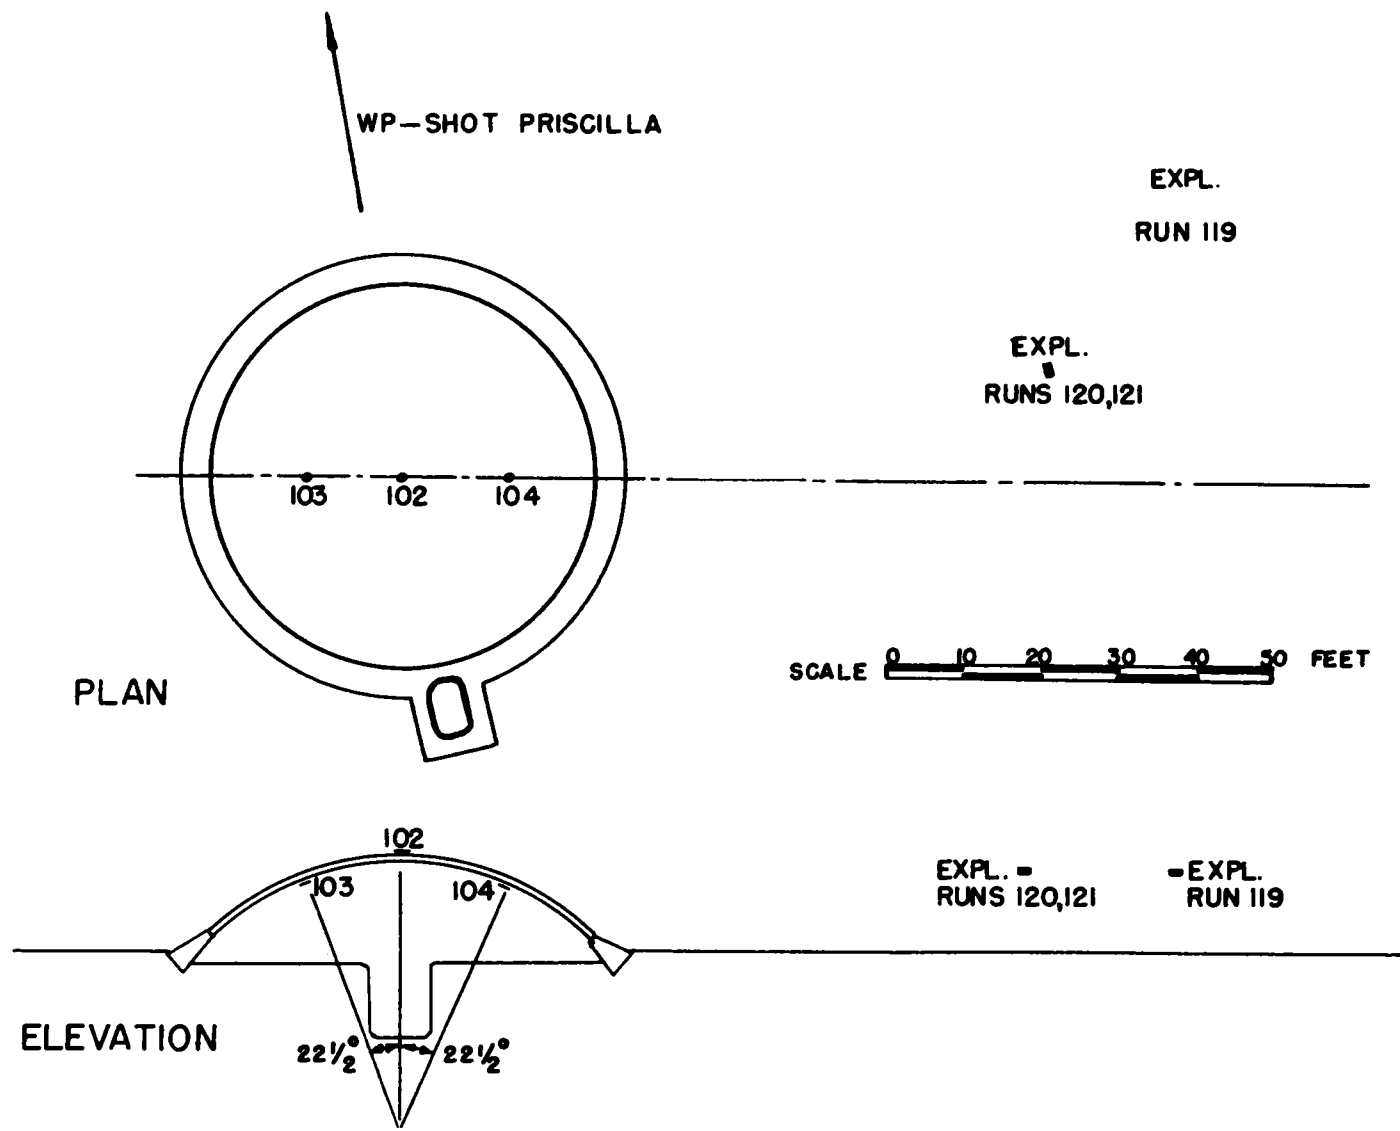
ACCELEROMETERS AND LOADING, CONCRETE DOME
